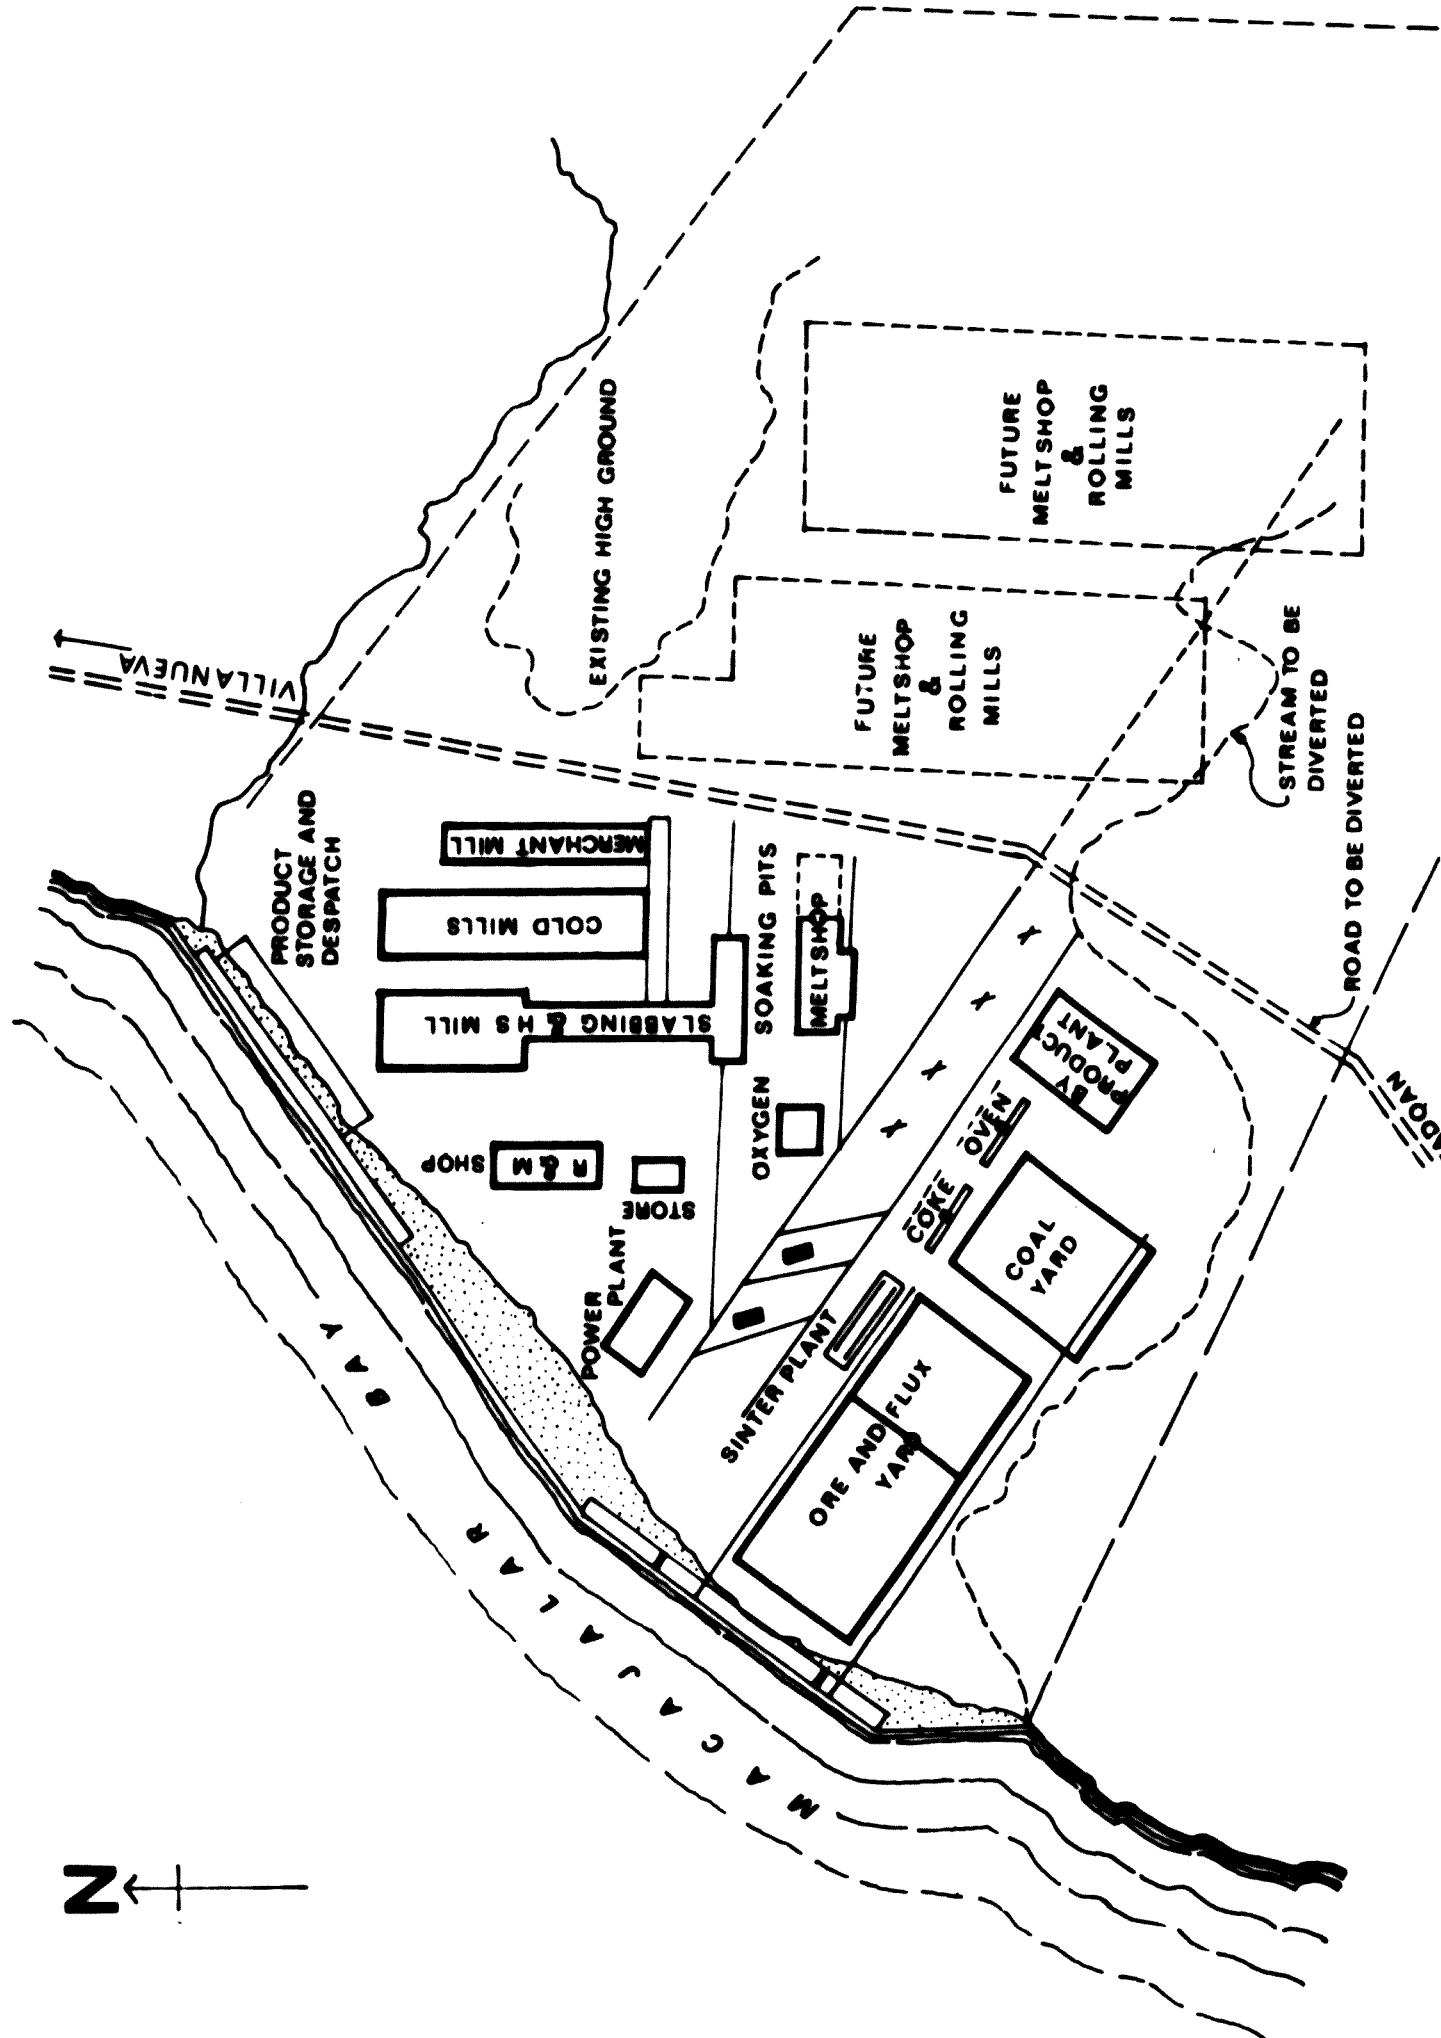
SUGGESTED LAYOUT FOR STEELWORKS - TAGLOAN
